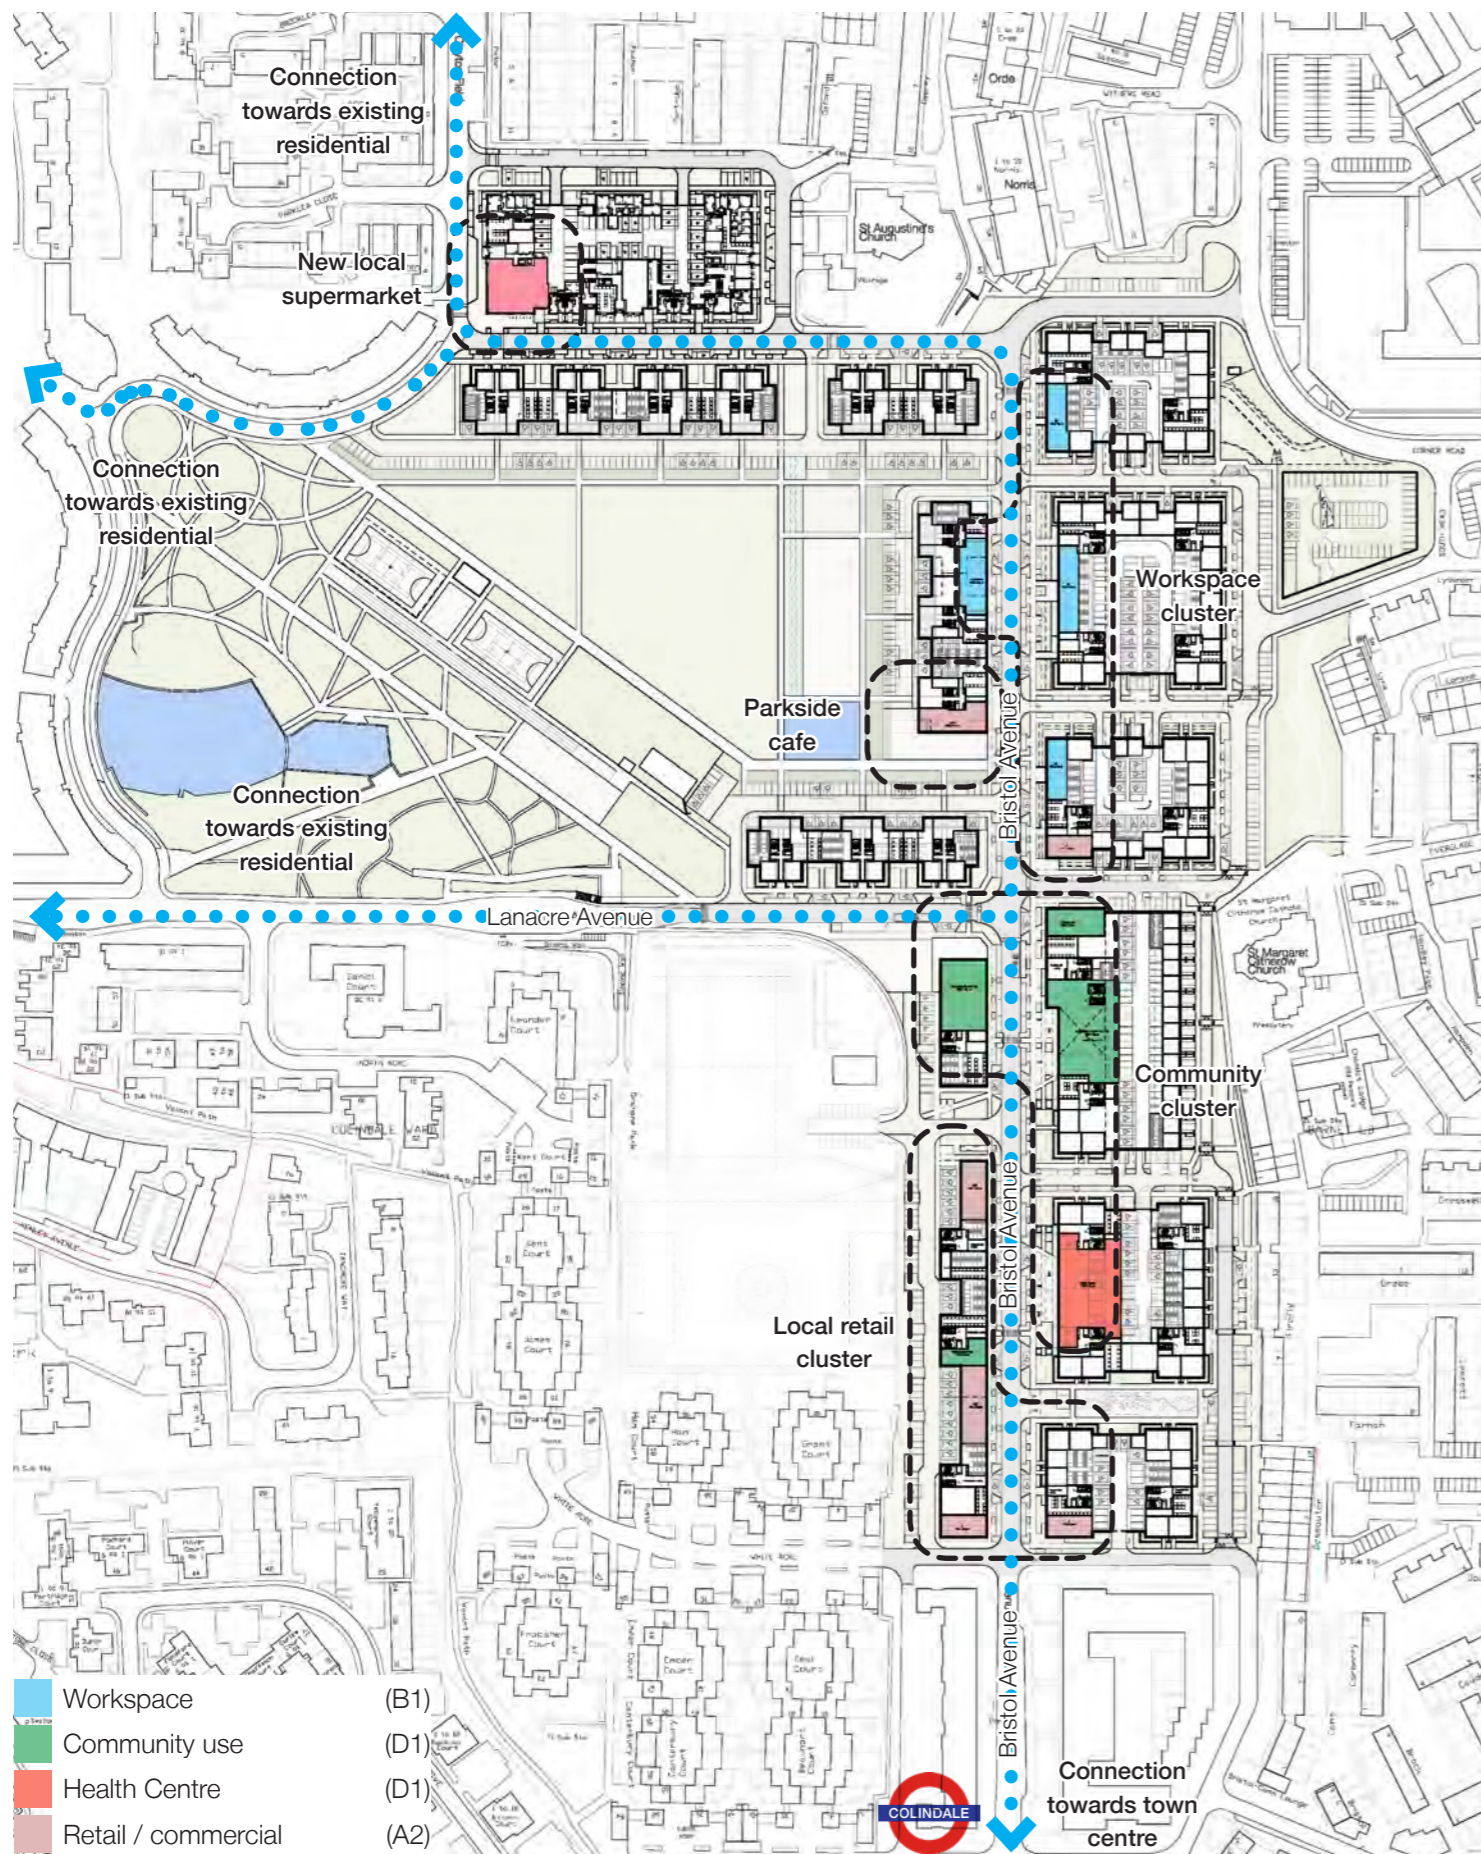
Illustrative ground floor masterplan showing plots and location of non-residential uses
